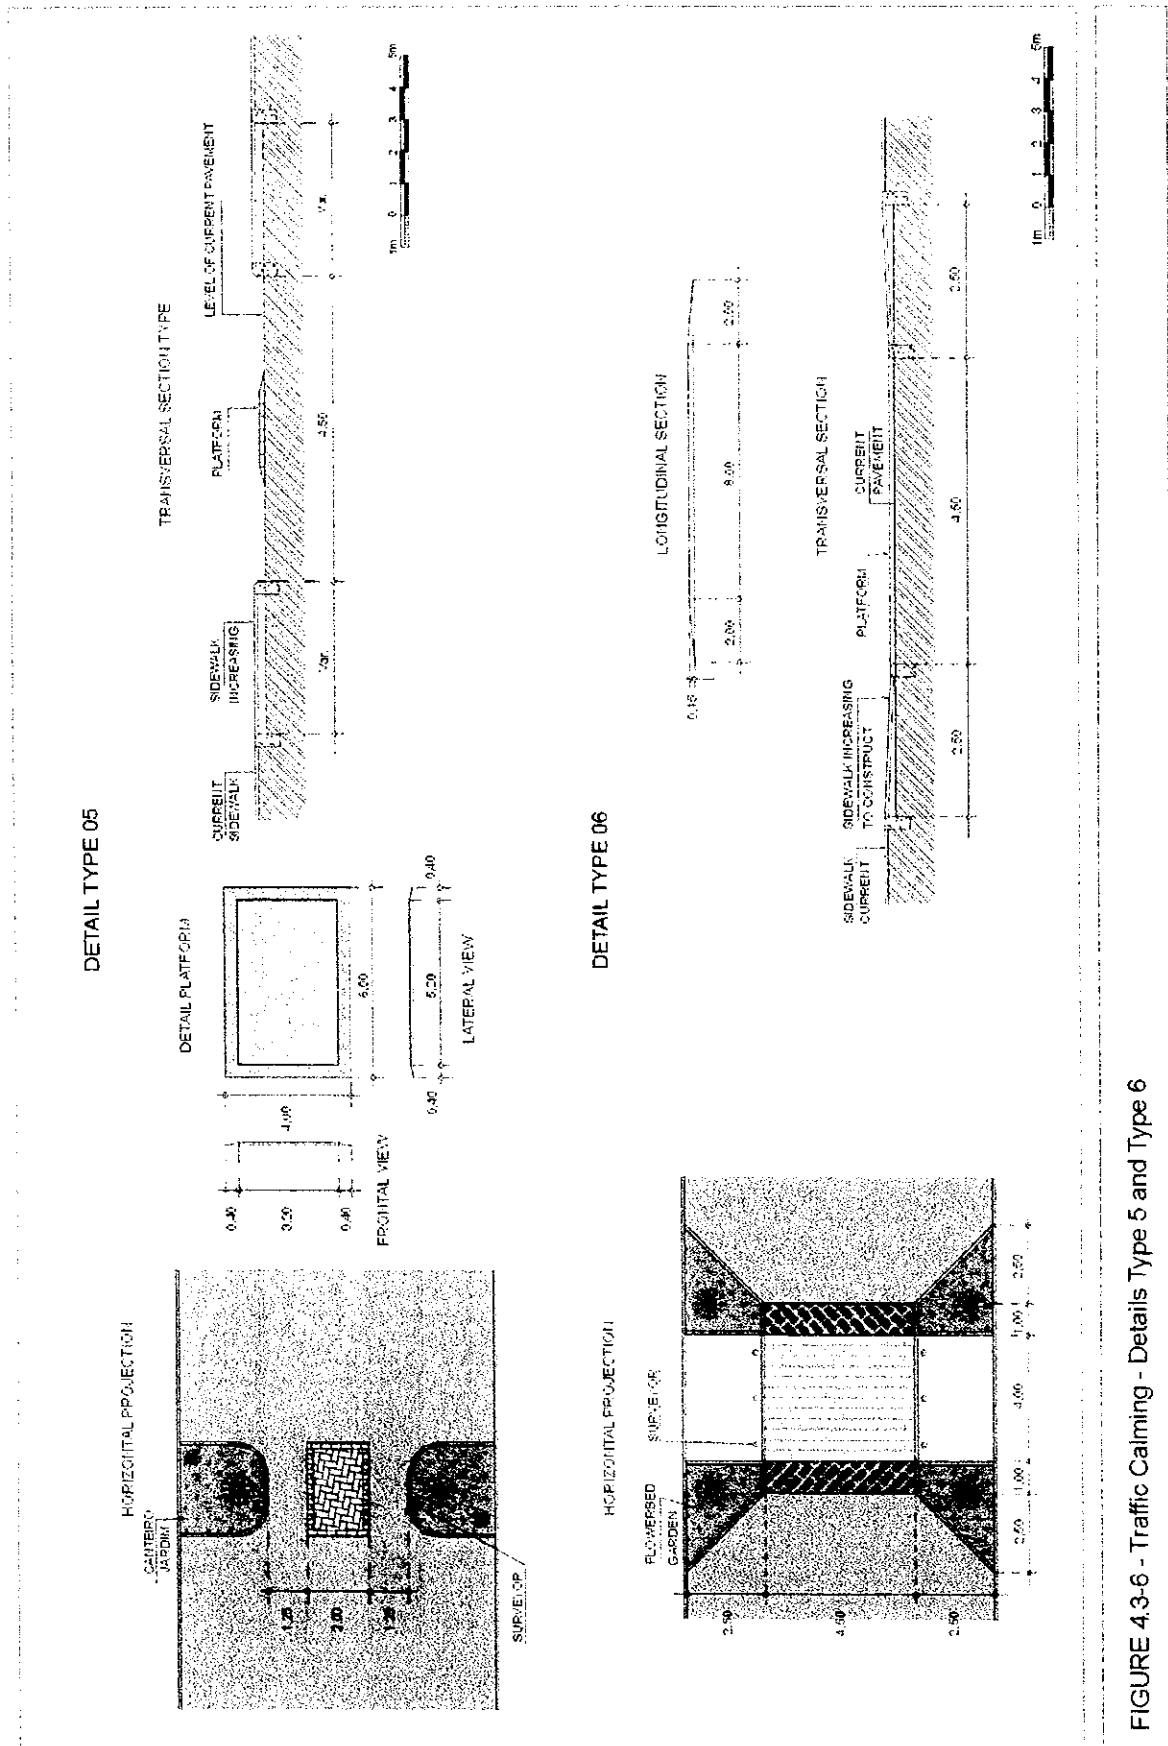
Traffic Calming - Details Type 5 and Type 6
